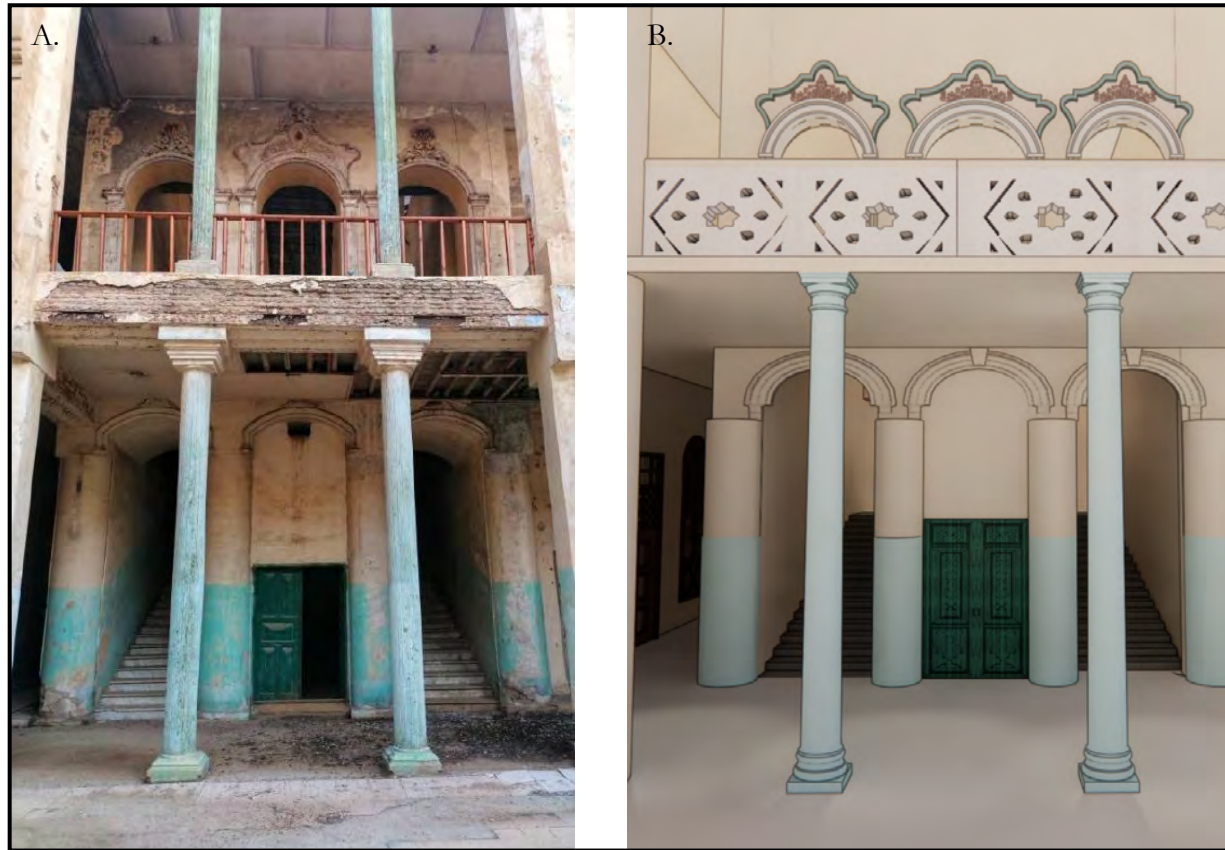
(A) main stair in Al-Byaddiah Palace (31), (B) 3D after repair the cracks in the wall (sketch by Layan).
